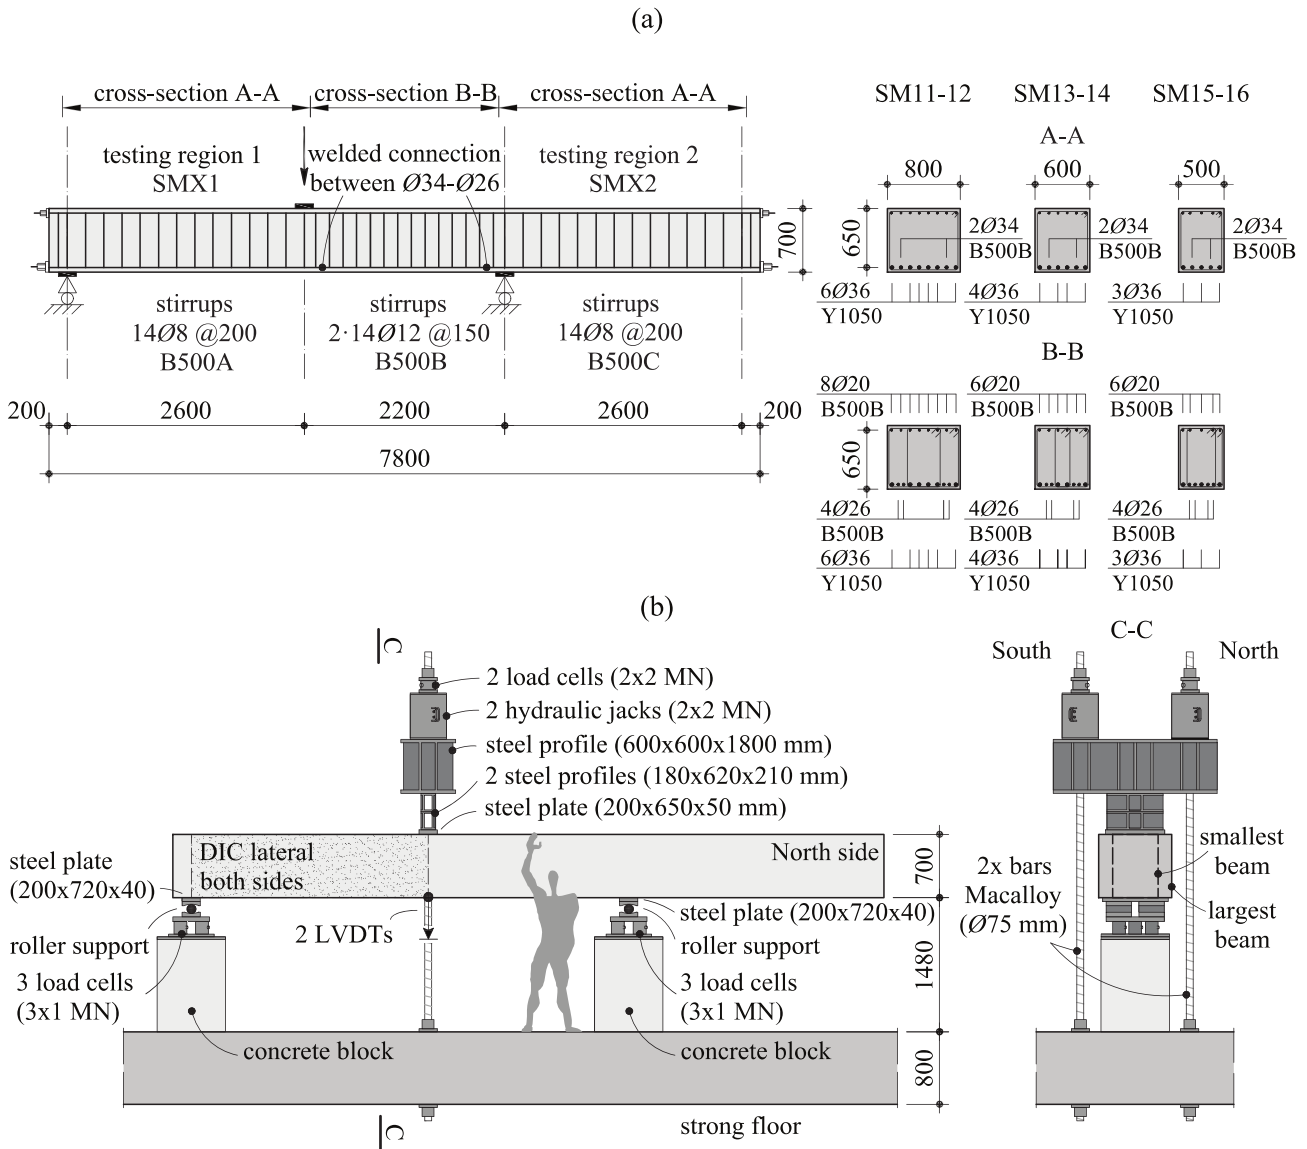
Geometry with reinforcement layouts (a) and test set-up (b) of the SM10 specimens. Monney (2022) [14]
